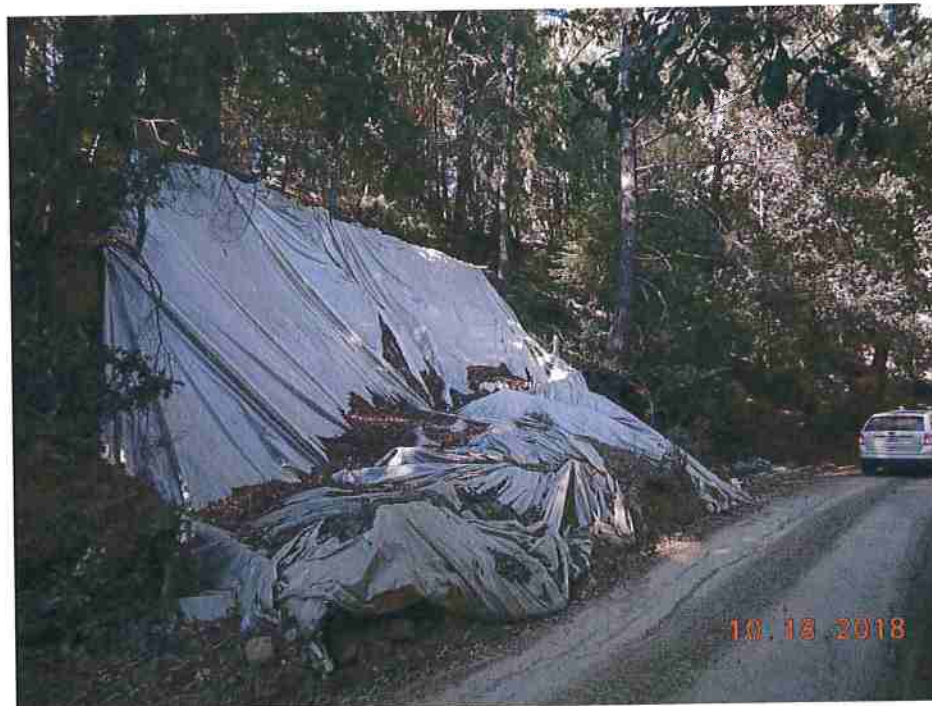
RP12. Facing north. Repair slide, pull material out of road way and stabilize failed slope.
